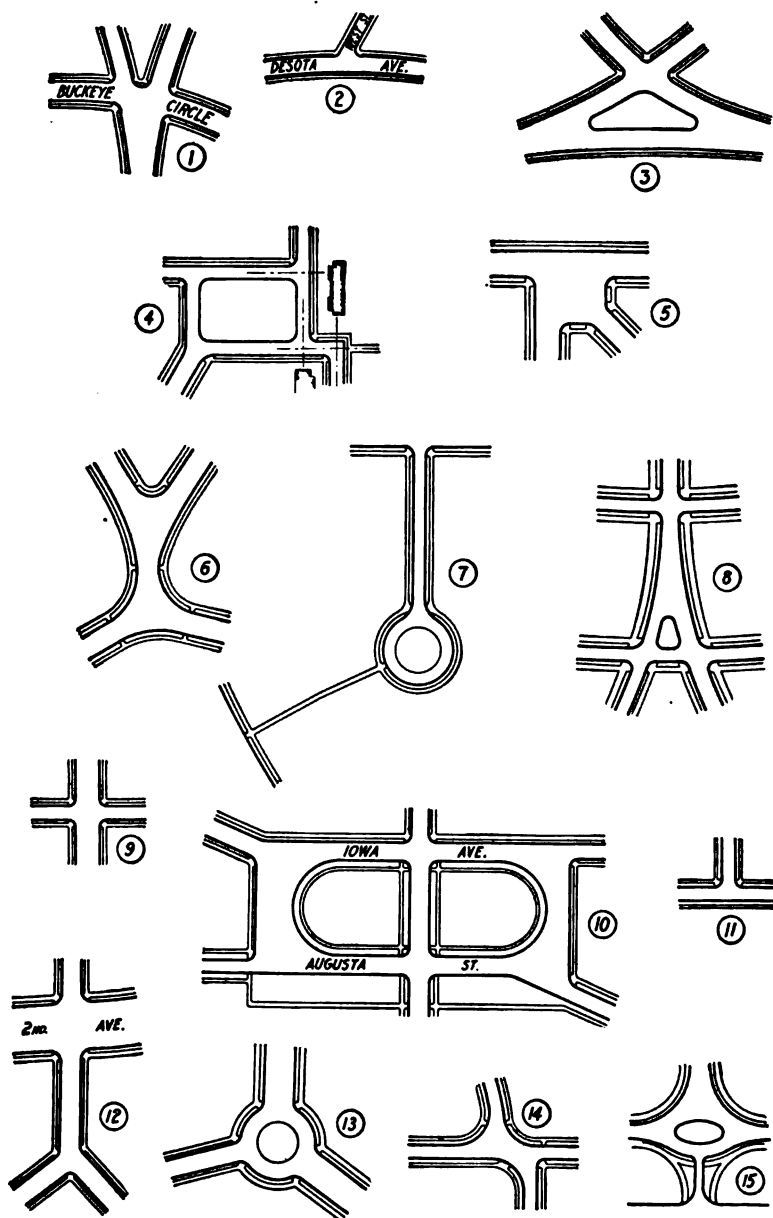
Typical street intersections:* (1) An enlargement at a five-way intersection. (2) Rounding of radius at acute intersection. (3) Typical parked area or island, at intersection. (4) A small parked square in a residential plan. (5,6) Intersections designed to facilitate traffic movement. (7) A court street
